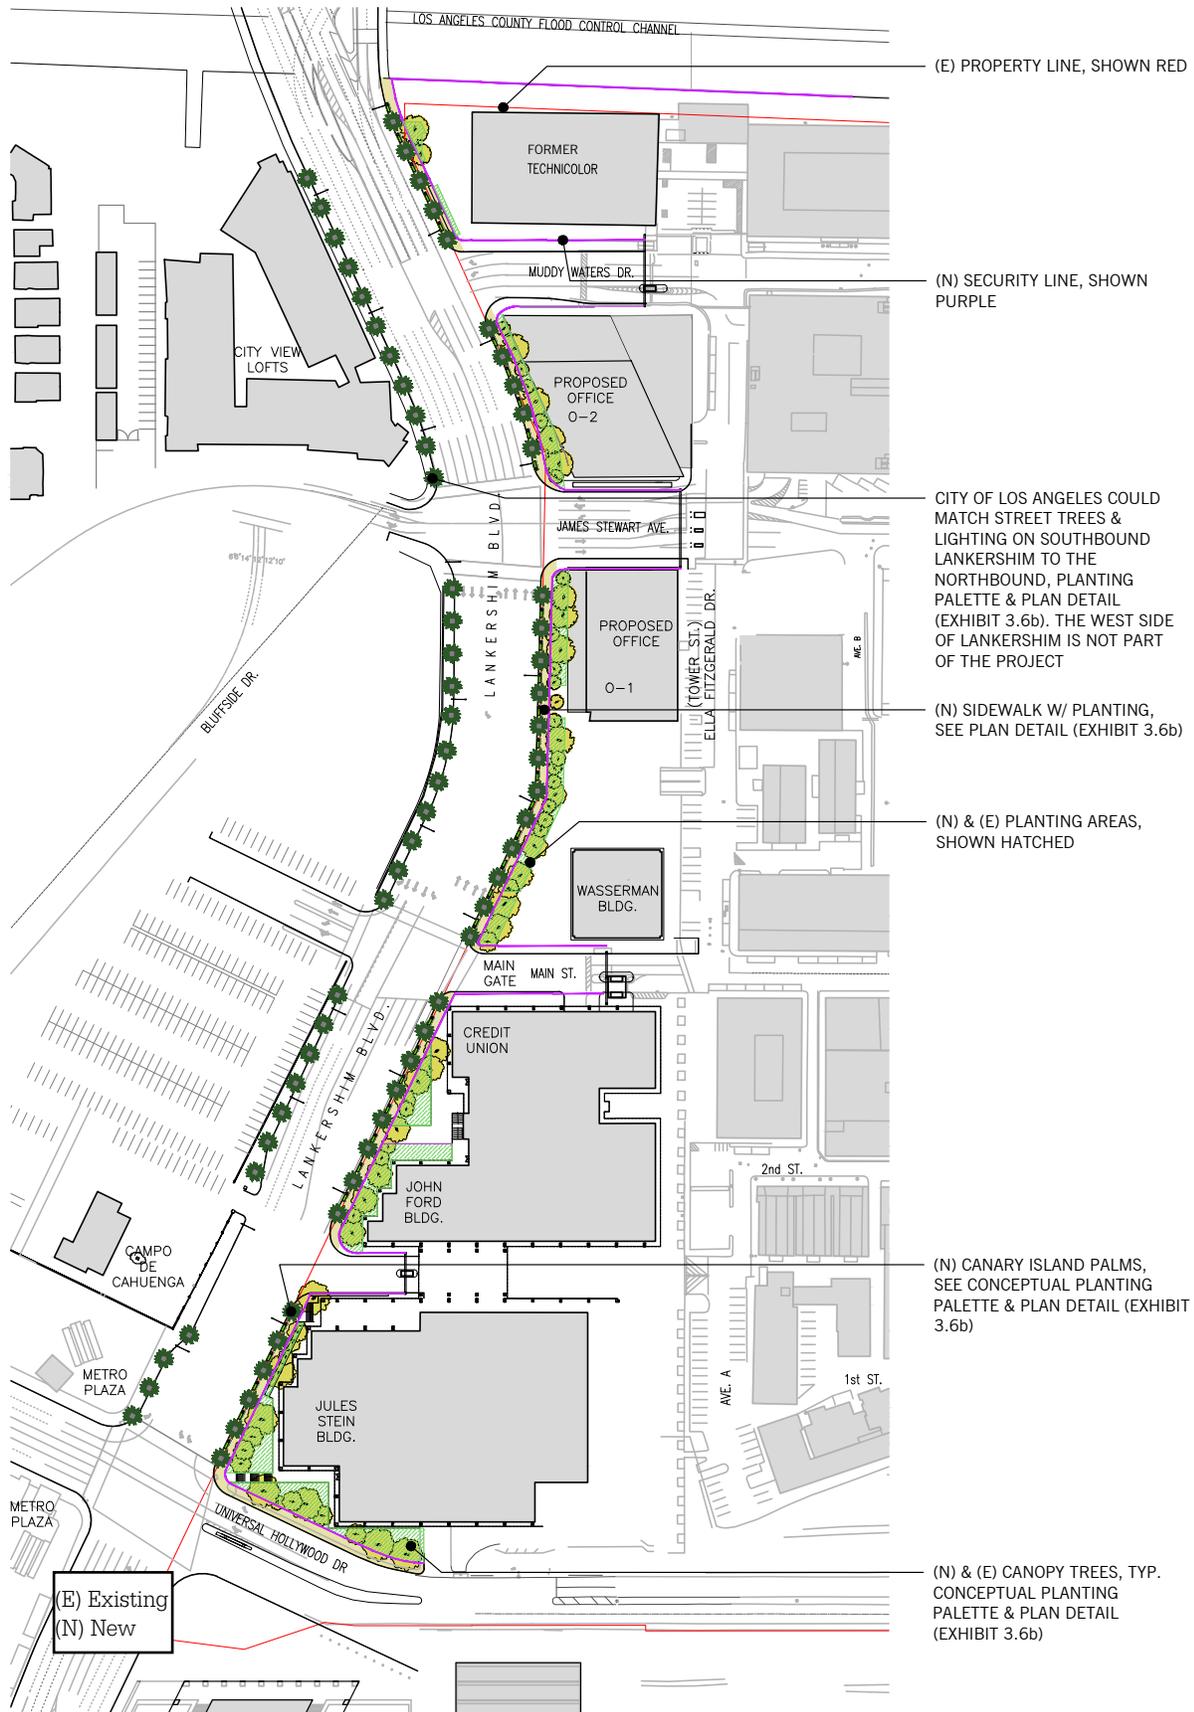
Conceptual Lankershim Streetscape Plan
